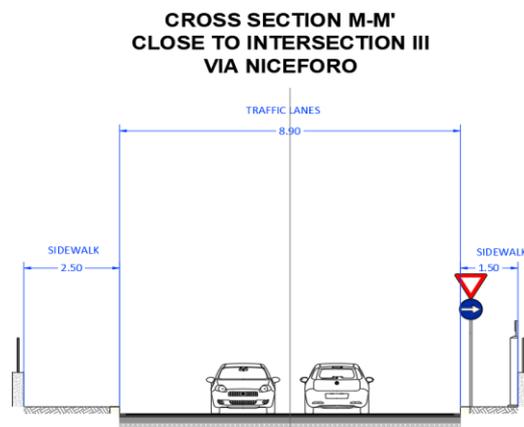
Cross section, intersection II – Via Niceforo.
